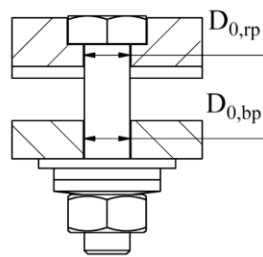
Reduction of the bolthole tolerances
